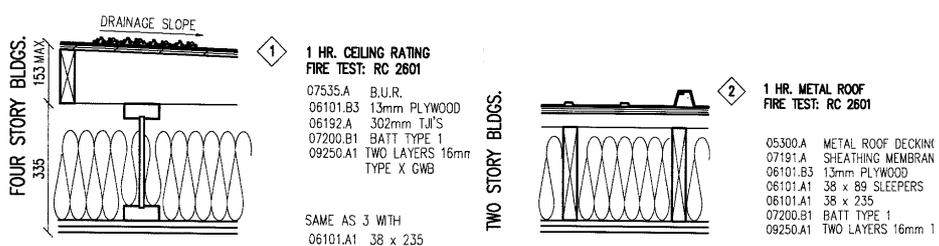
Drawing 780-06-002, Typical combustible roof/ceiling construction
